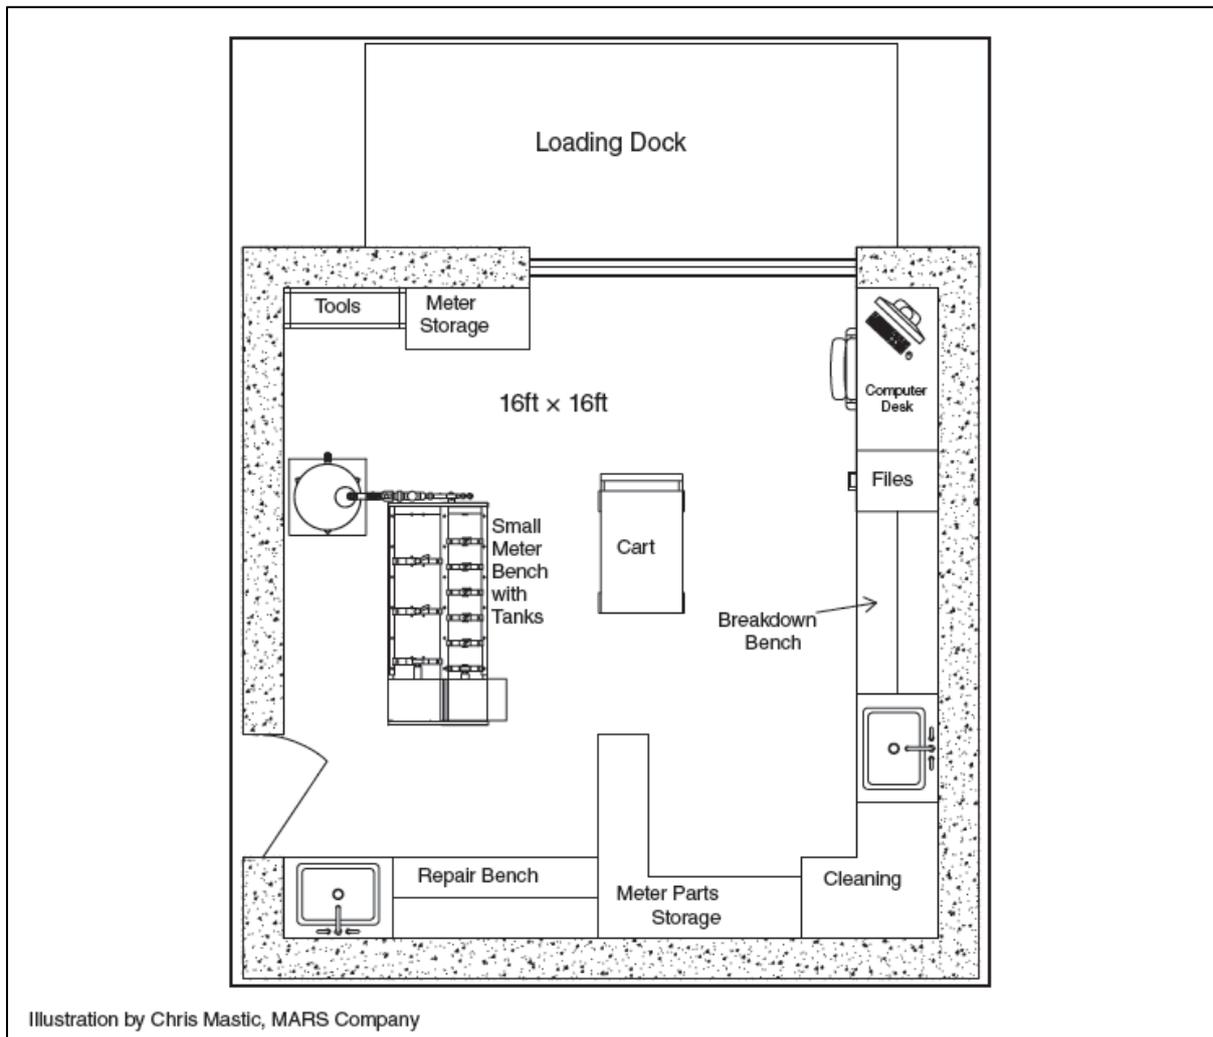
Recommended Meter Testing Facility Workplace for Modern Meter Shop (AWWA M6)
